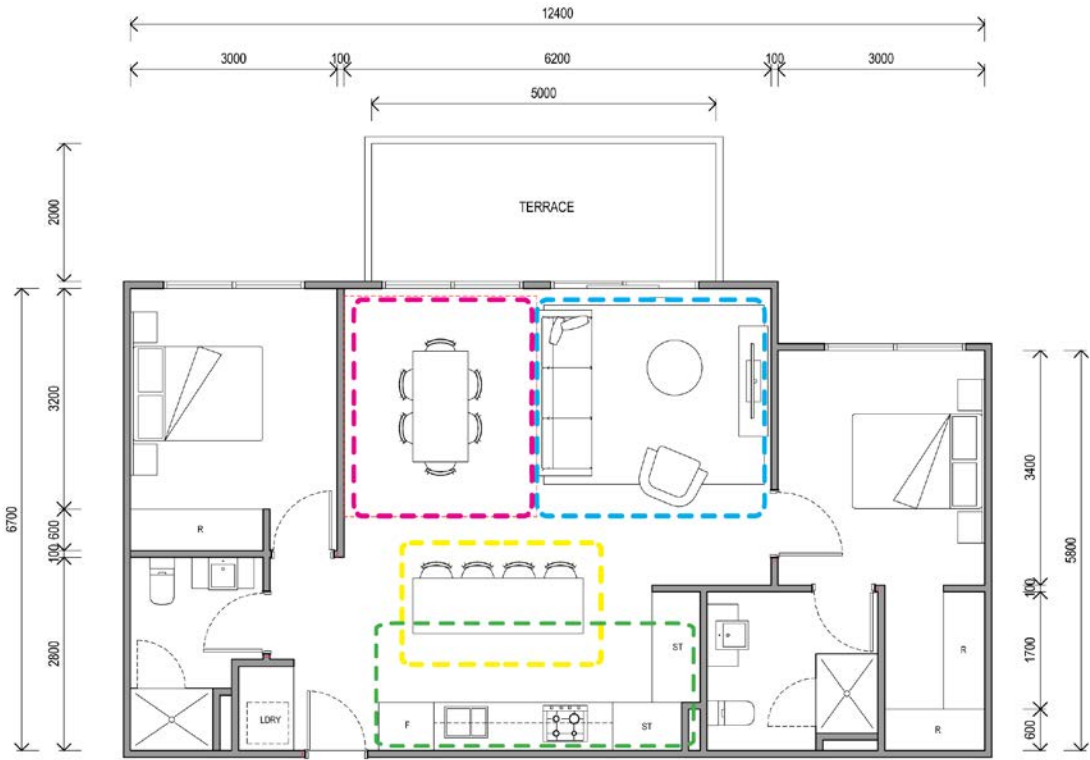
12.4m x 6.7m 2 bed Apartment Plan
